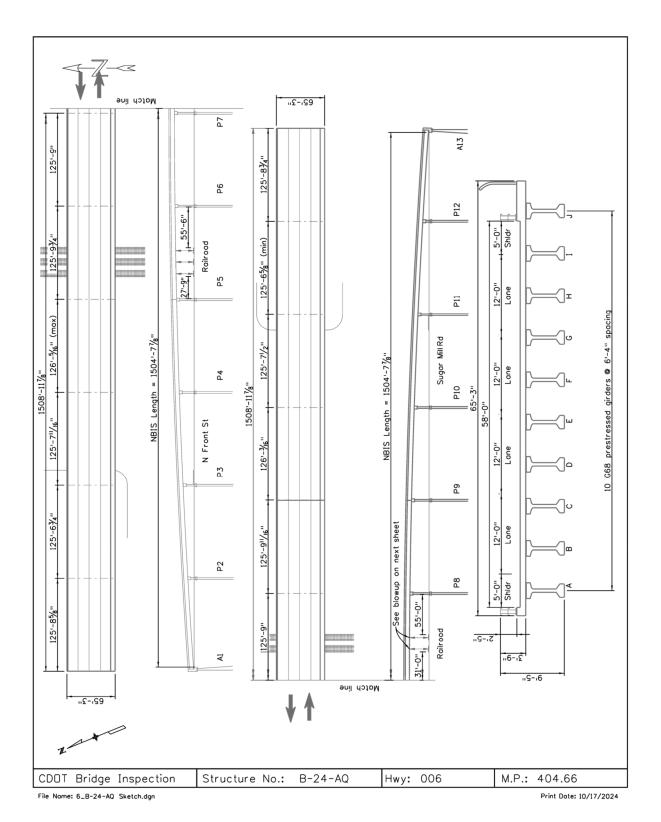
Bridge Inspection Sketch – Example 6
